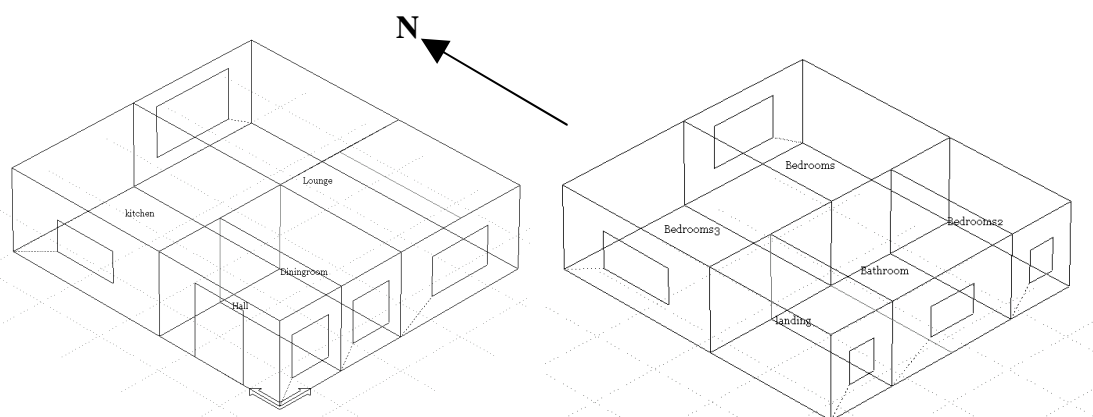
ESP-r diagram of ground floor (left) and first floor (right) of modelling dwelling
